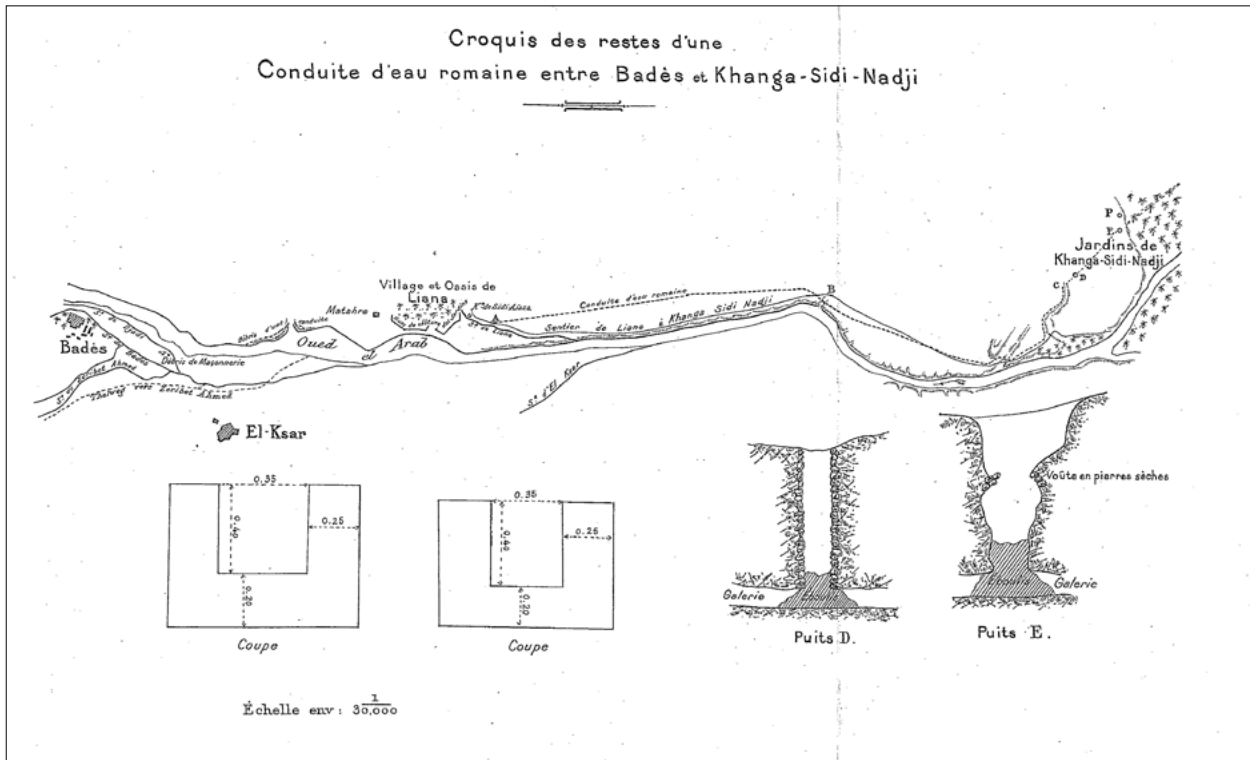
Water supply conduct connecting Bades to Khanguet Sidi Nadji: Location and details. [De TORCY 1911].
